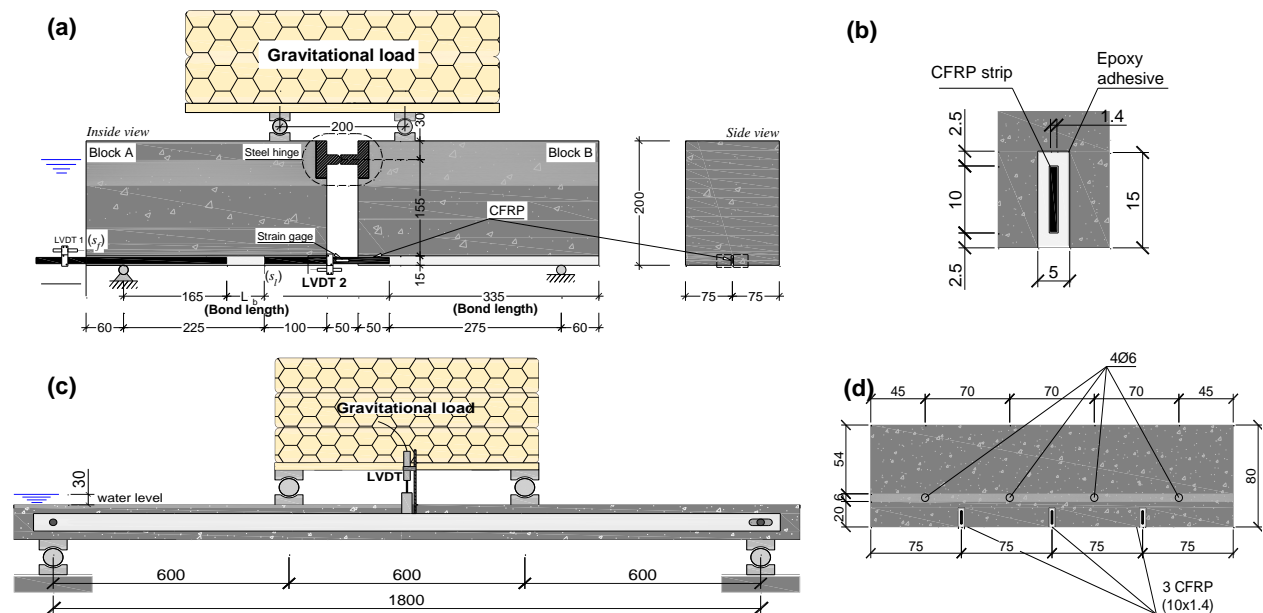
Tests configuration: (a) beam pullout specimen; (b) geometry details of the strengthening; (c) slab specimen; (d) slab cross-section (dimensions in mm).
